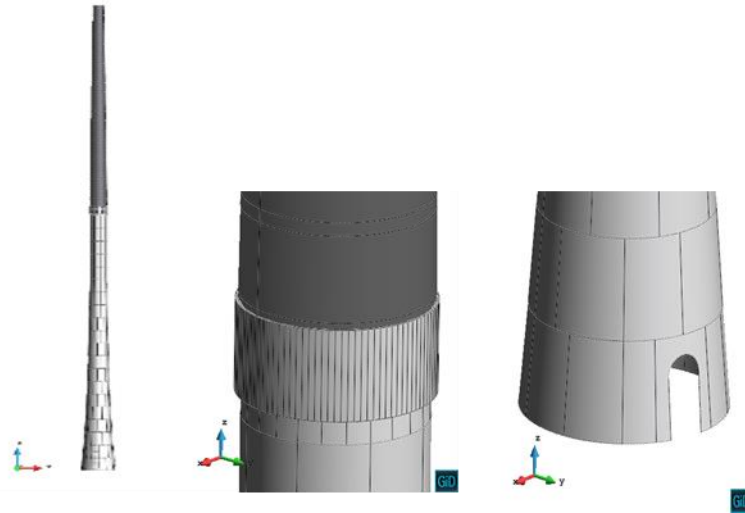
Hybrid tower, steel-concrete junction and tower entrance door in detail (Botz et al. 2017a)
